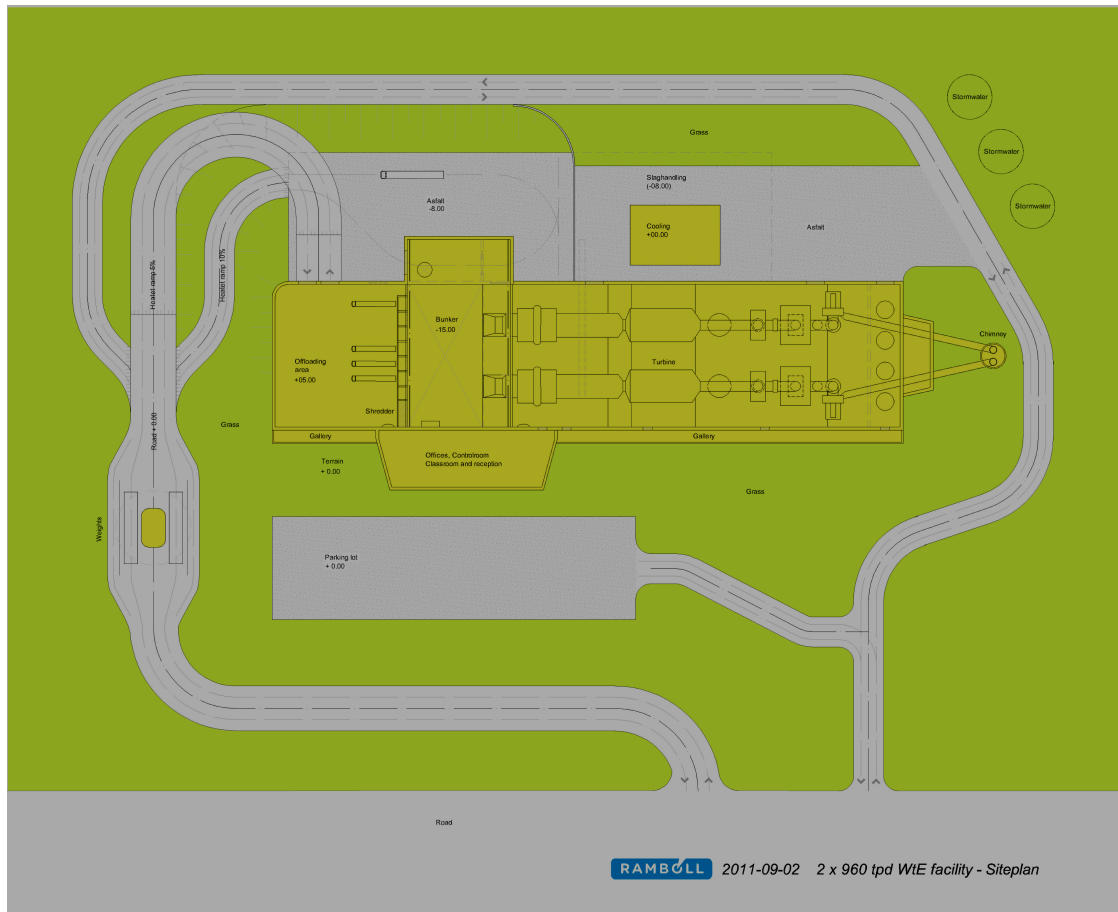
Site plan for two-line x 960 tons/day plant (EEC)
